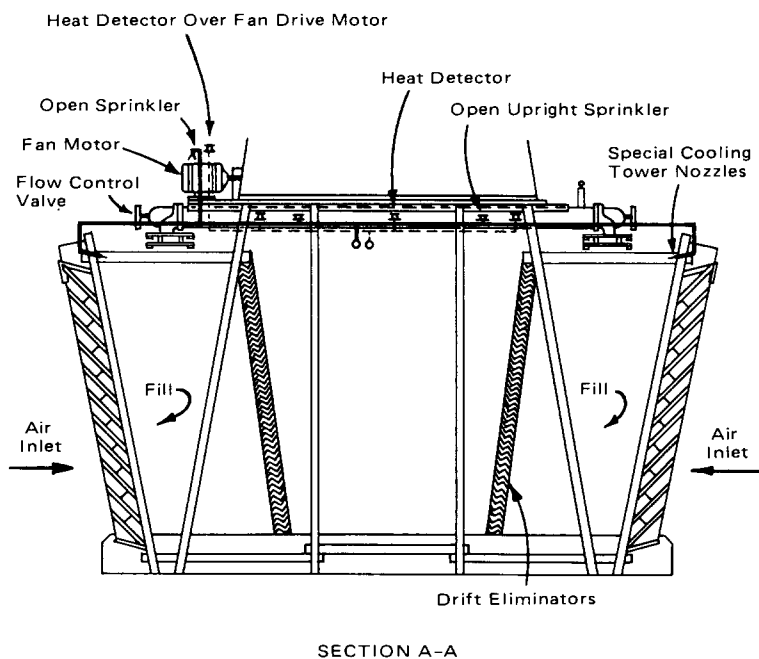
(d) Typical deluge fire protection arrangement for crossflow towers.
